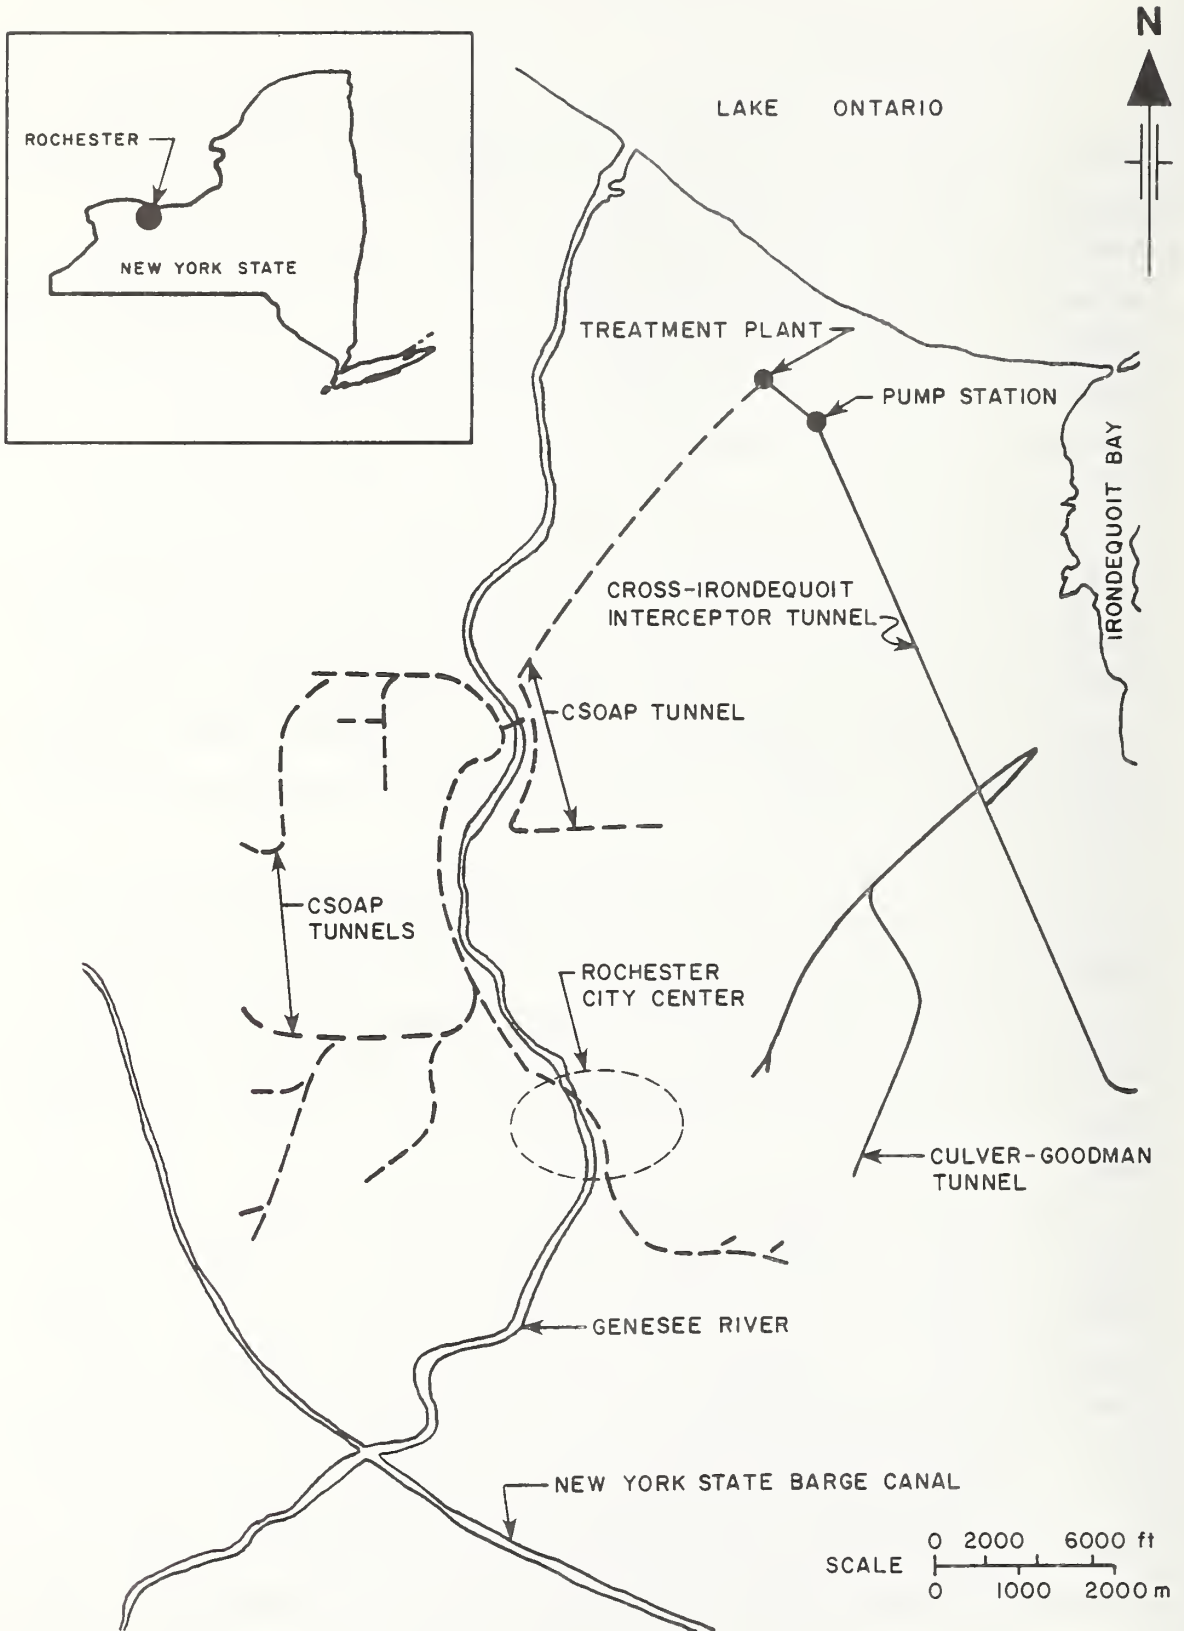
PLAN VIEW OF THE ROCHESTER STORM WATER AND SEWER TUNNEL SYSTEM
